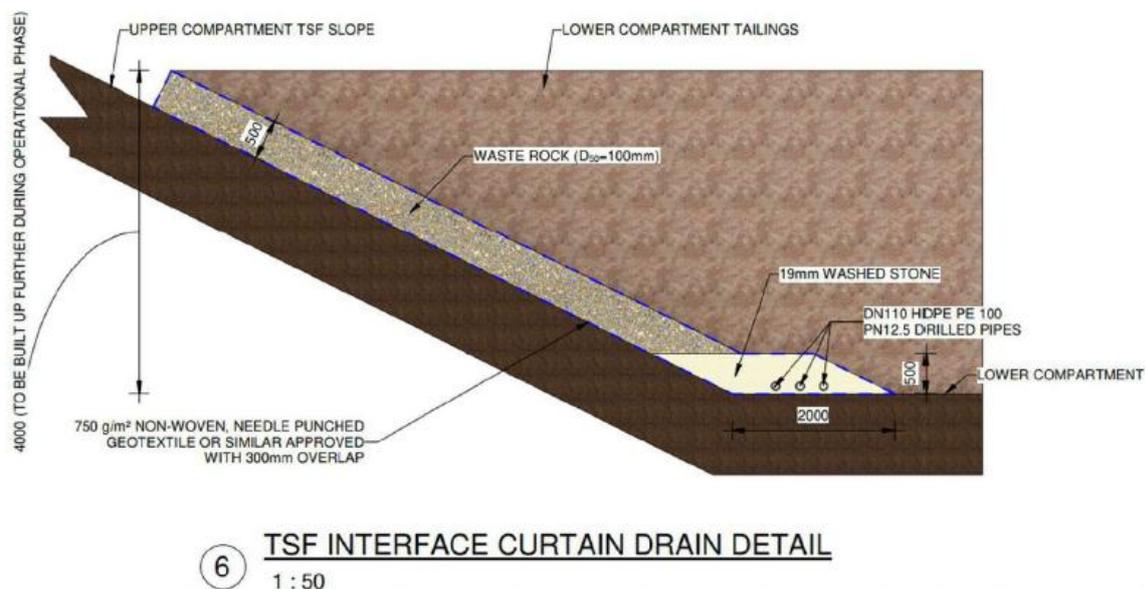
Typical Detail of the Interface drain (Eco Elementum, 2025)
